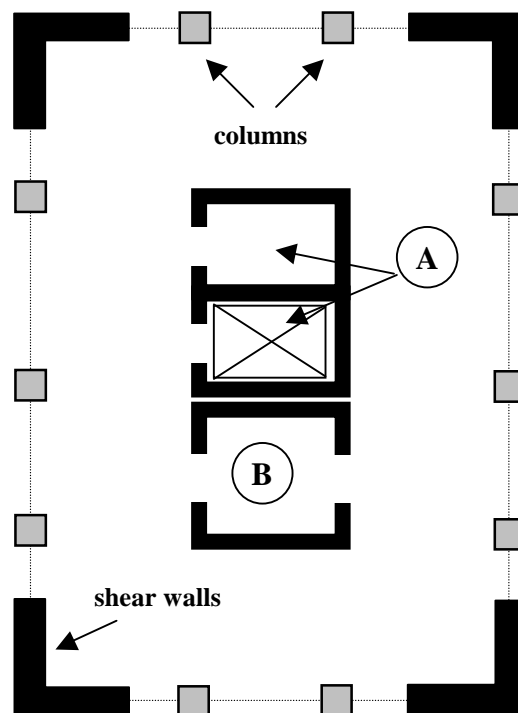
Conceptual floor plan of a reinforced, concrete dual system building (frames + shear walls). (A) Vertical communication shaft consisting of an elevator (marked with crossed rectangle) and stairs. (B) Shelter shaft.
